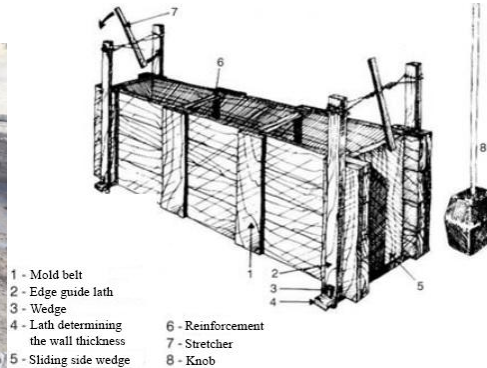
In cast and masonry adobe systems used wall formwork and mold forming elements (Acun and Gürdal, 2003)
